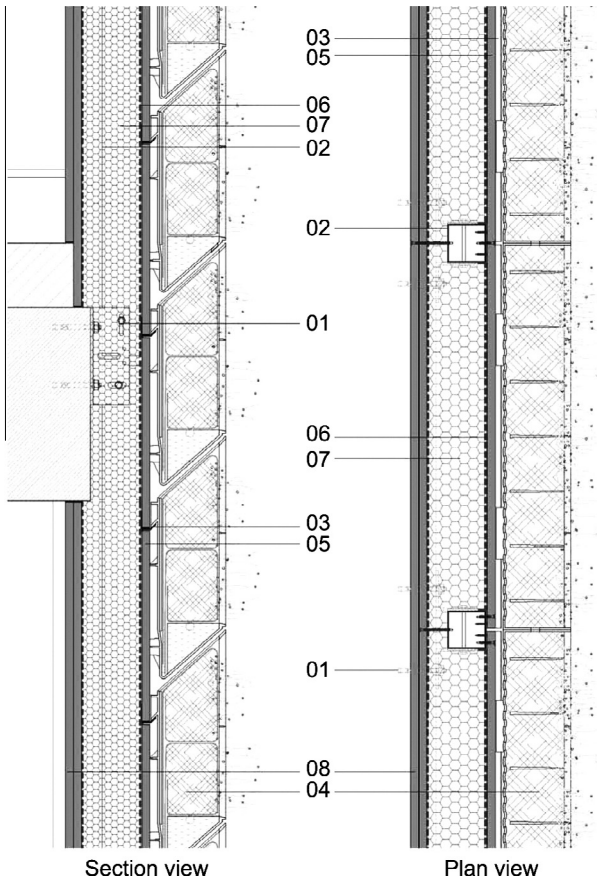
Plan and section views corresponding to the enclosure system of the Natural Water Tank Façade (NWTF).
